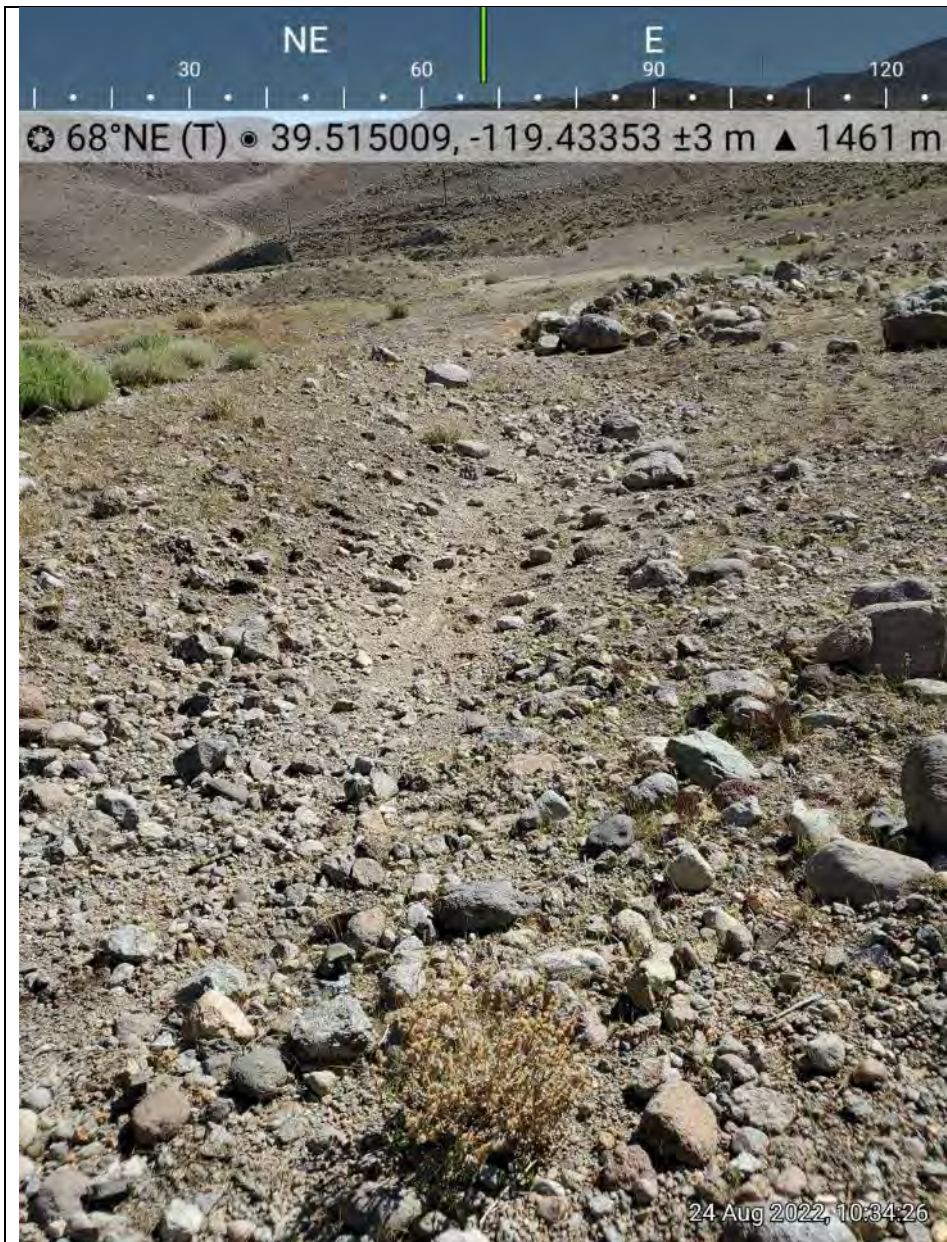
AR 1 out of rock check dam #2 and into next retention basin.
